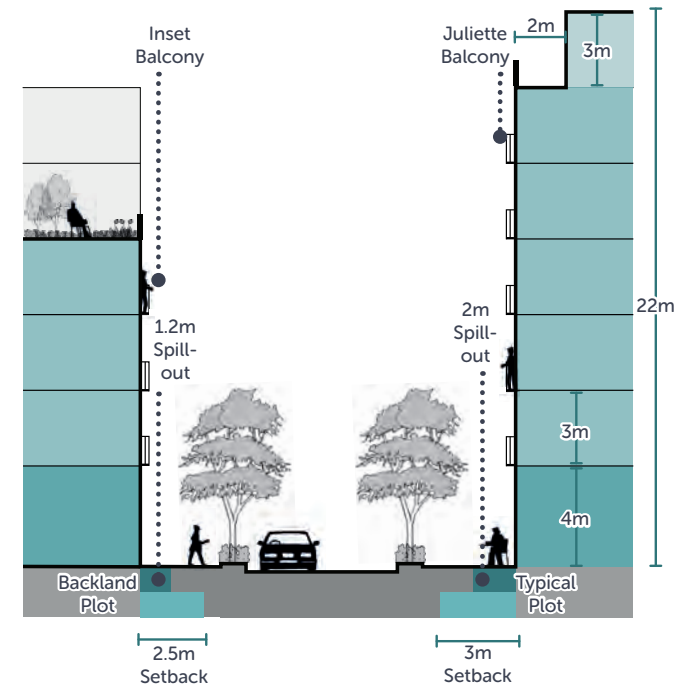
Waterfront Area Type - Street Section | Guidance Example
